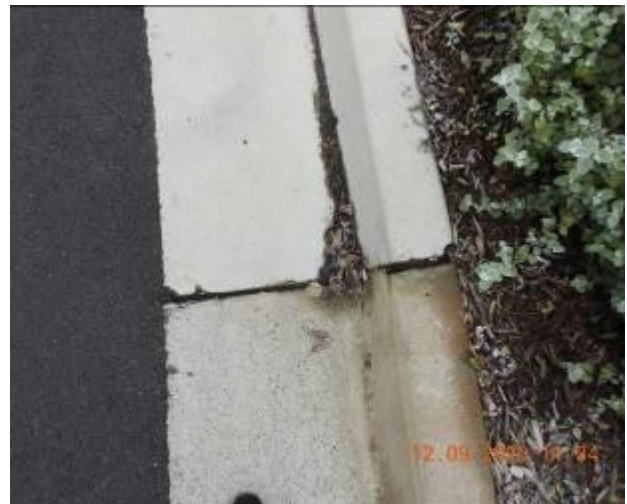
Crack propagation and loss of material through kerb and gutter
